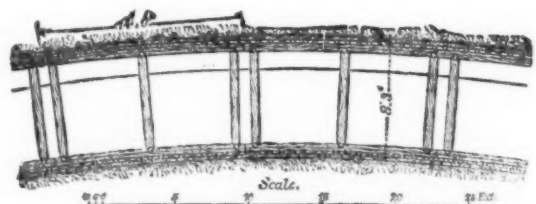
SECTION OF TIMBERING OF TRENCH AT C, D (FIG. 4).
